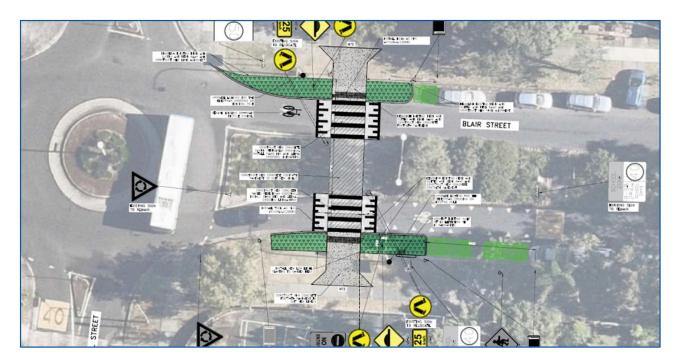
Proposed raised pedestrian crossing on Blair Street, North Bondi, East of the intersection with Mitchell Street.
